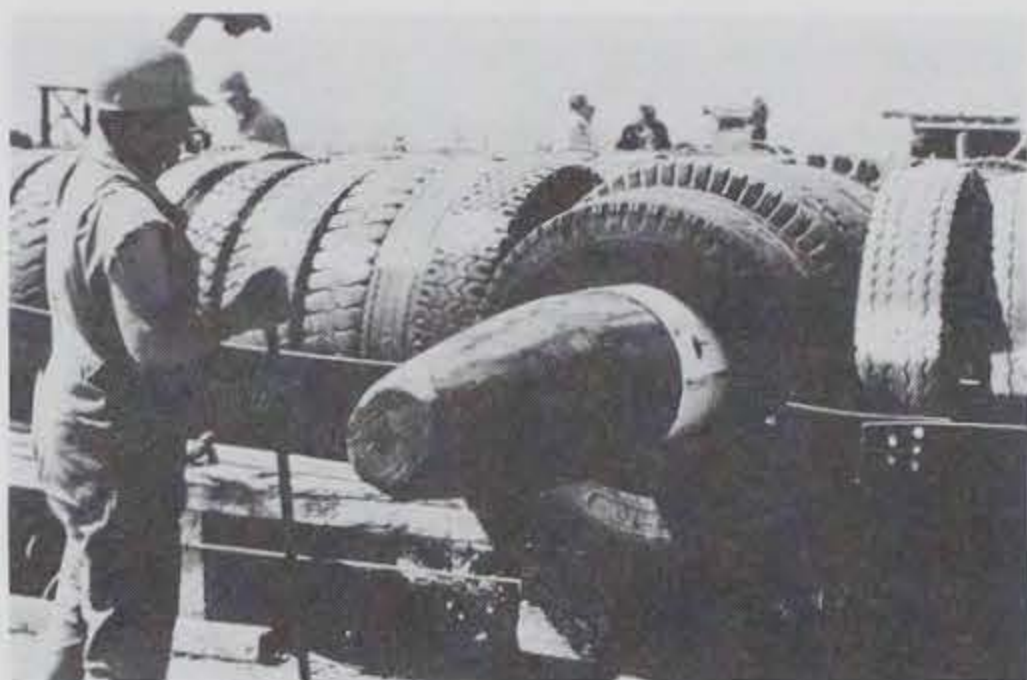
Shoving steel pipe through tires (tires around pipes not foamed).
